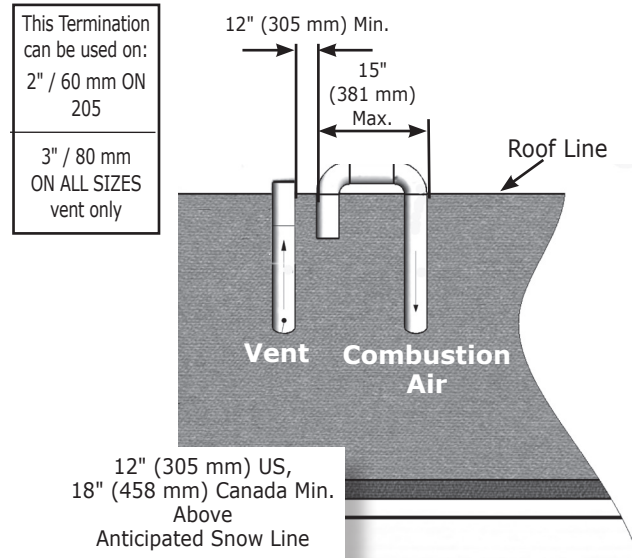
(3" / 80 mm ONLY) Single Wall Exhaust Kit and Air Intake Minimum Distance Center to Center
